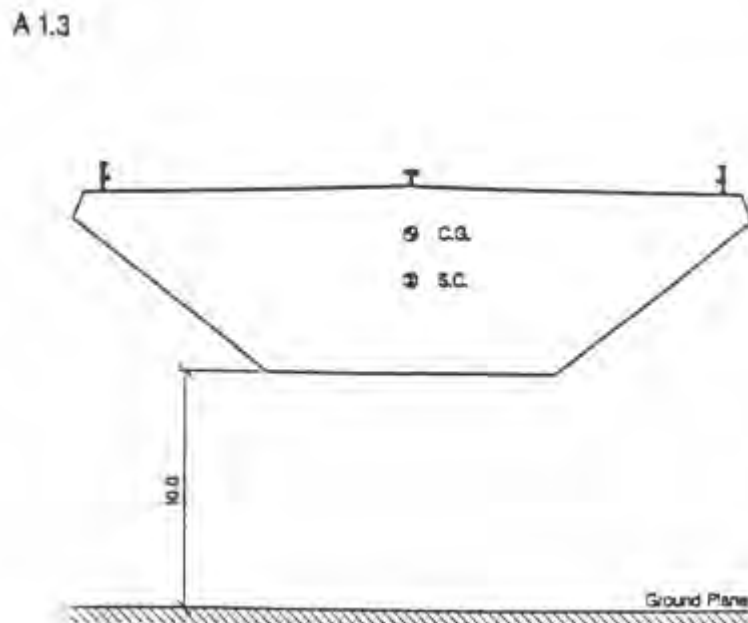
A1.1 deck cross section, Approaches, Storebælt East Bridge.
